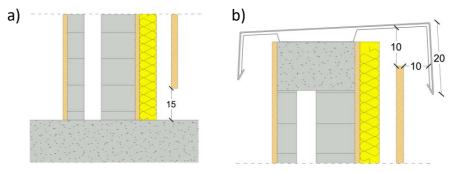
Inlet (a) and outlet (b) sections of ventilated facade. All measures are expressed in cm
